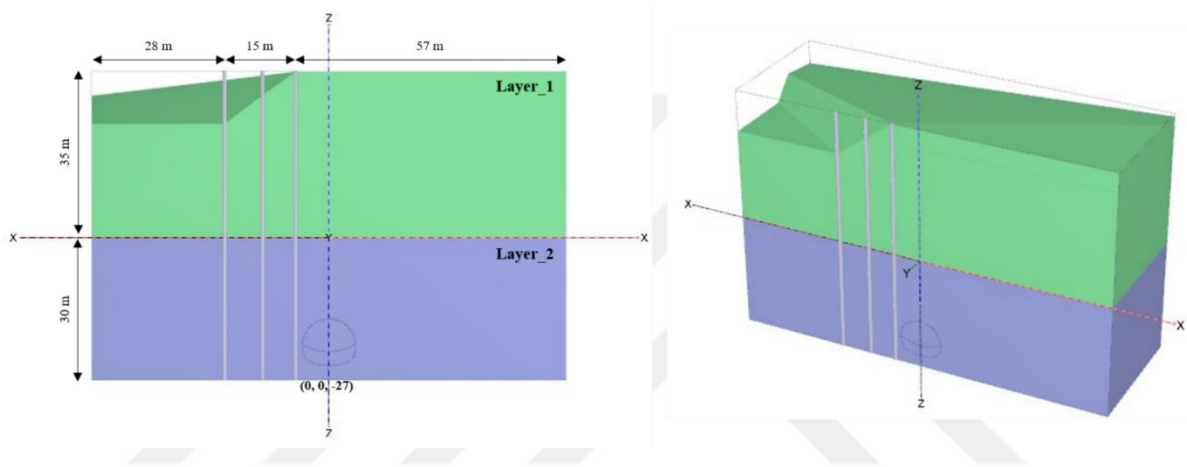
Front and three-dimensional view of Bayburt tuff block
